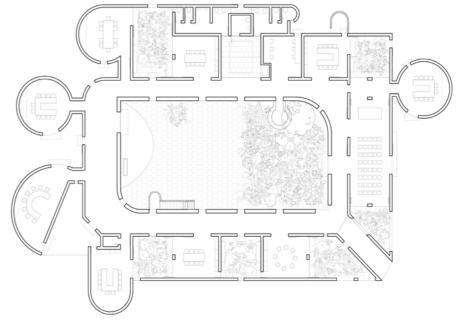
Floorplan of the School in Gandhinagar (SEALAB n.d.)
